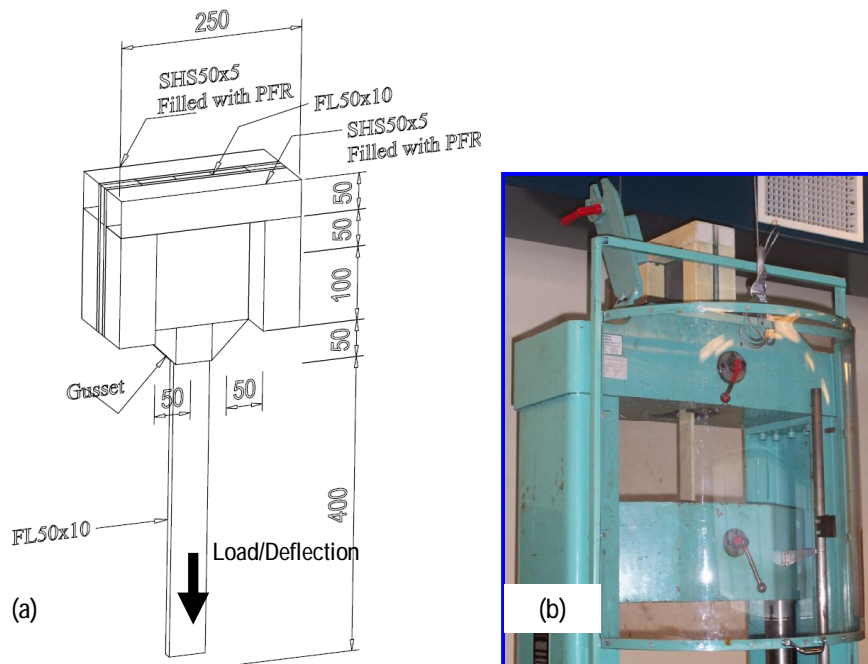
P209 - Bracket (a) dimensions, and (b) test layout
